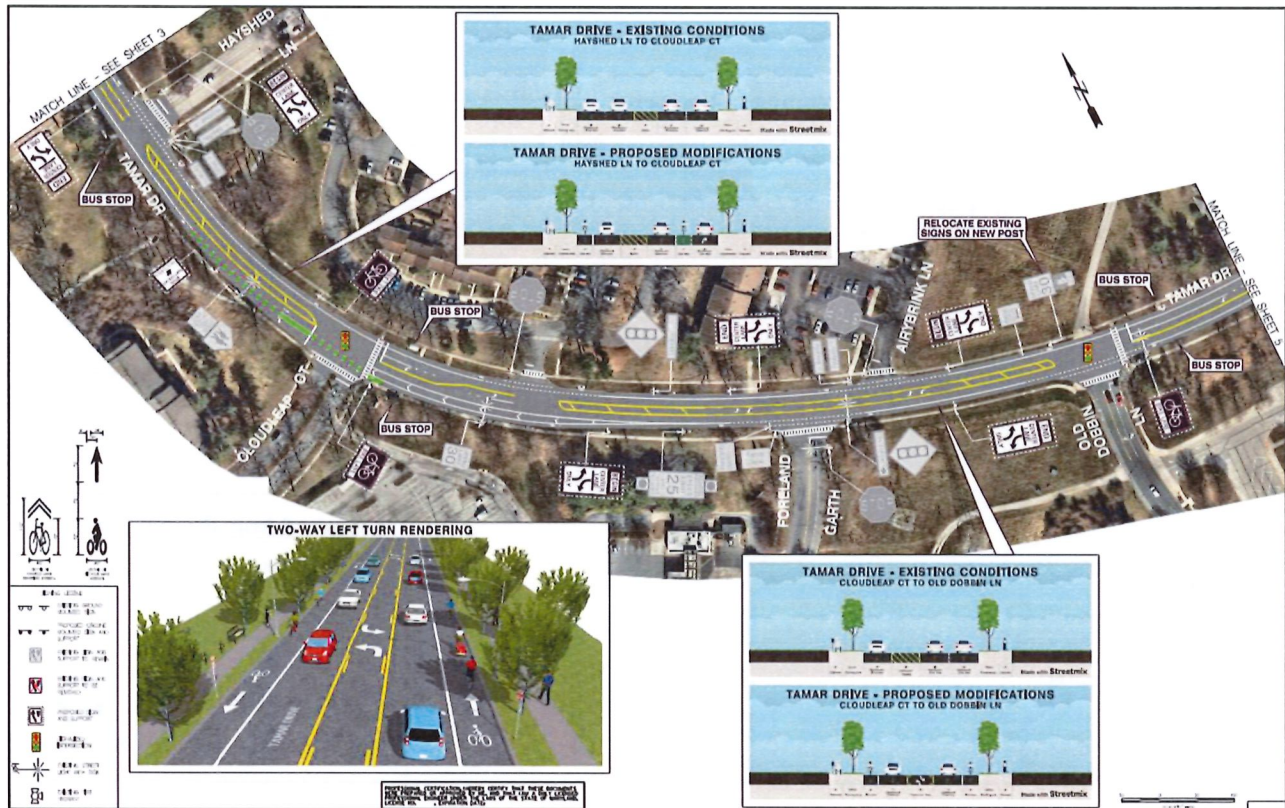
Tamar Drive Complete Street Design along Site Frontage
